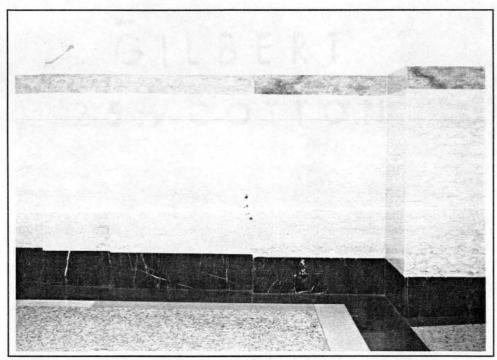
Marble wainscoting and Terrazzo floor
